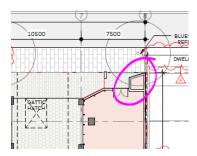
Structural element in the north-east corner extracted from the ground floor plan.
